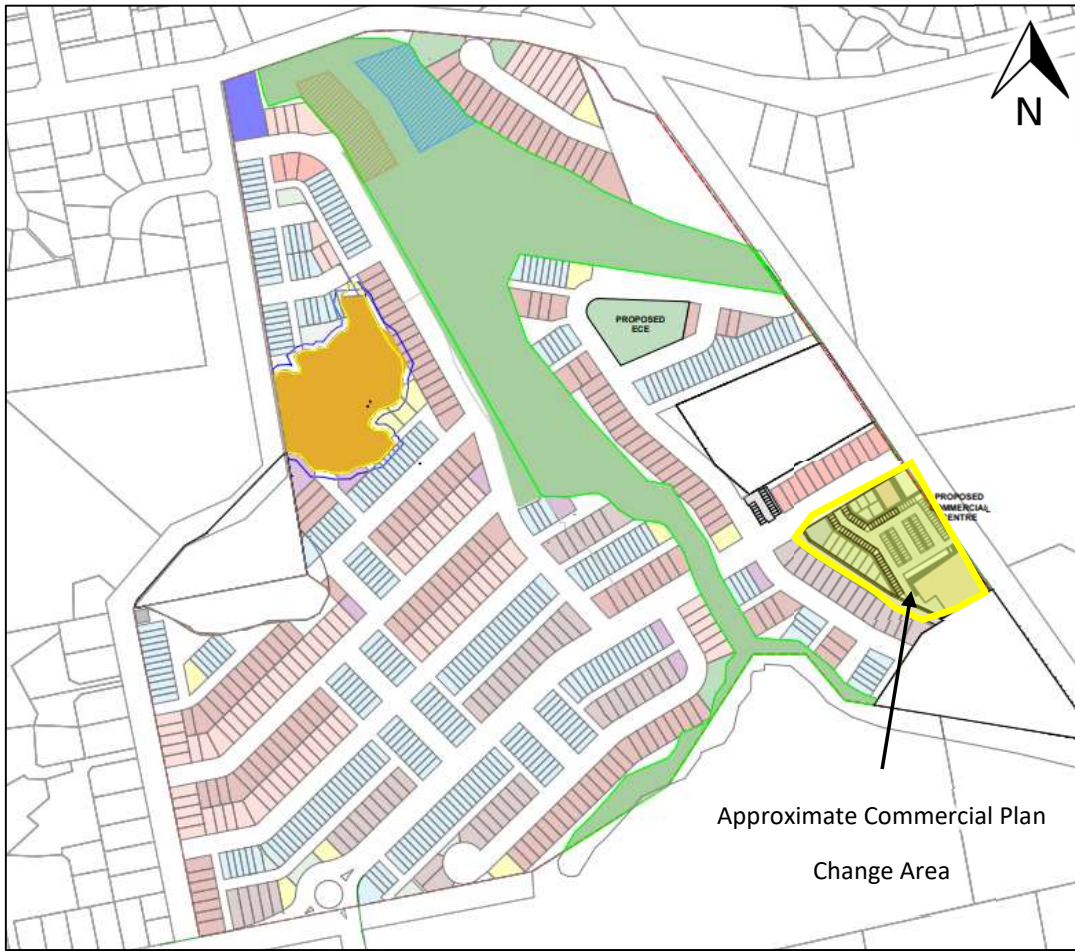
PC76 Plan Change Area (Source: Civix Ltd Earthworks Report)
